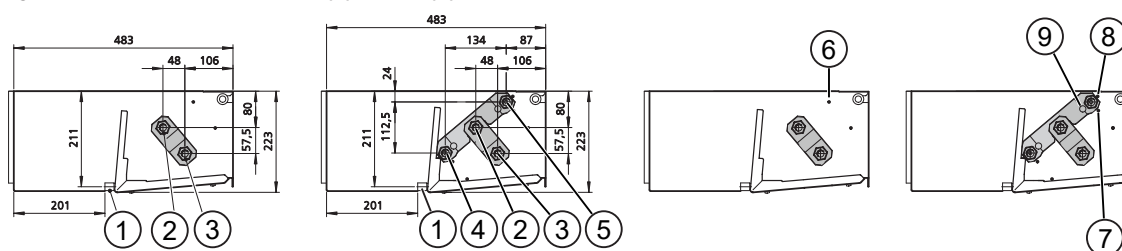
Ceiling-mounted basic unit, 2-pipe and 4-pipe
